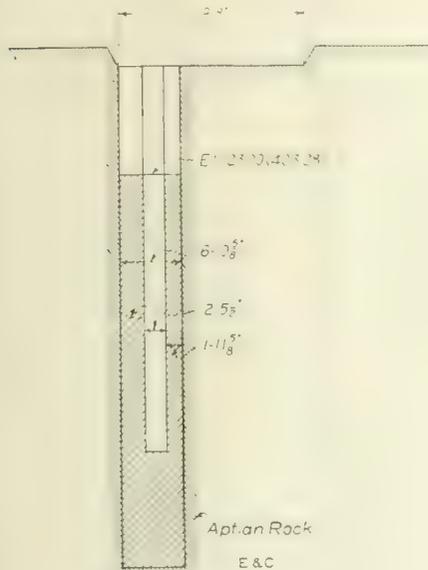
Vertical Section of Cut-off Wall Showing Inspection Pit.
